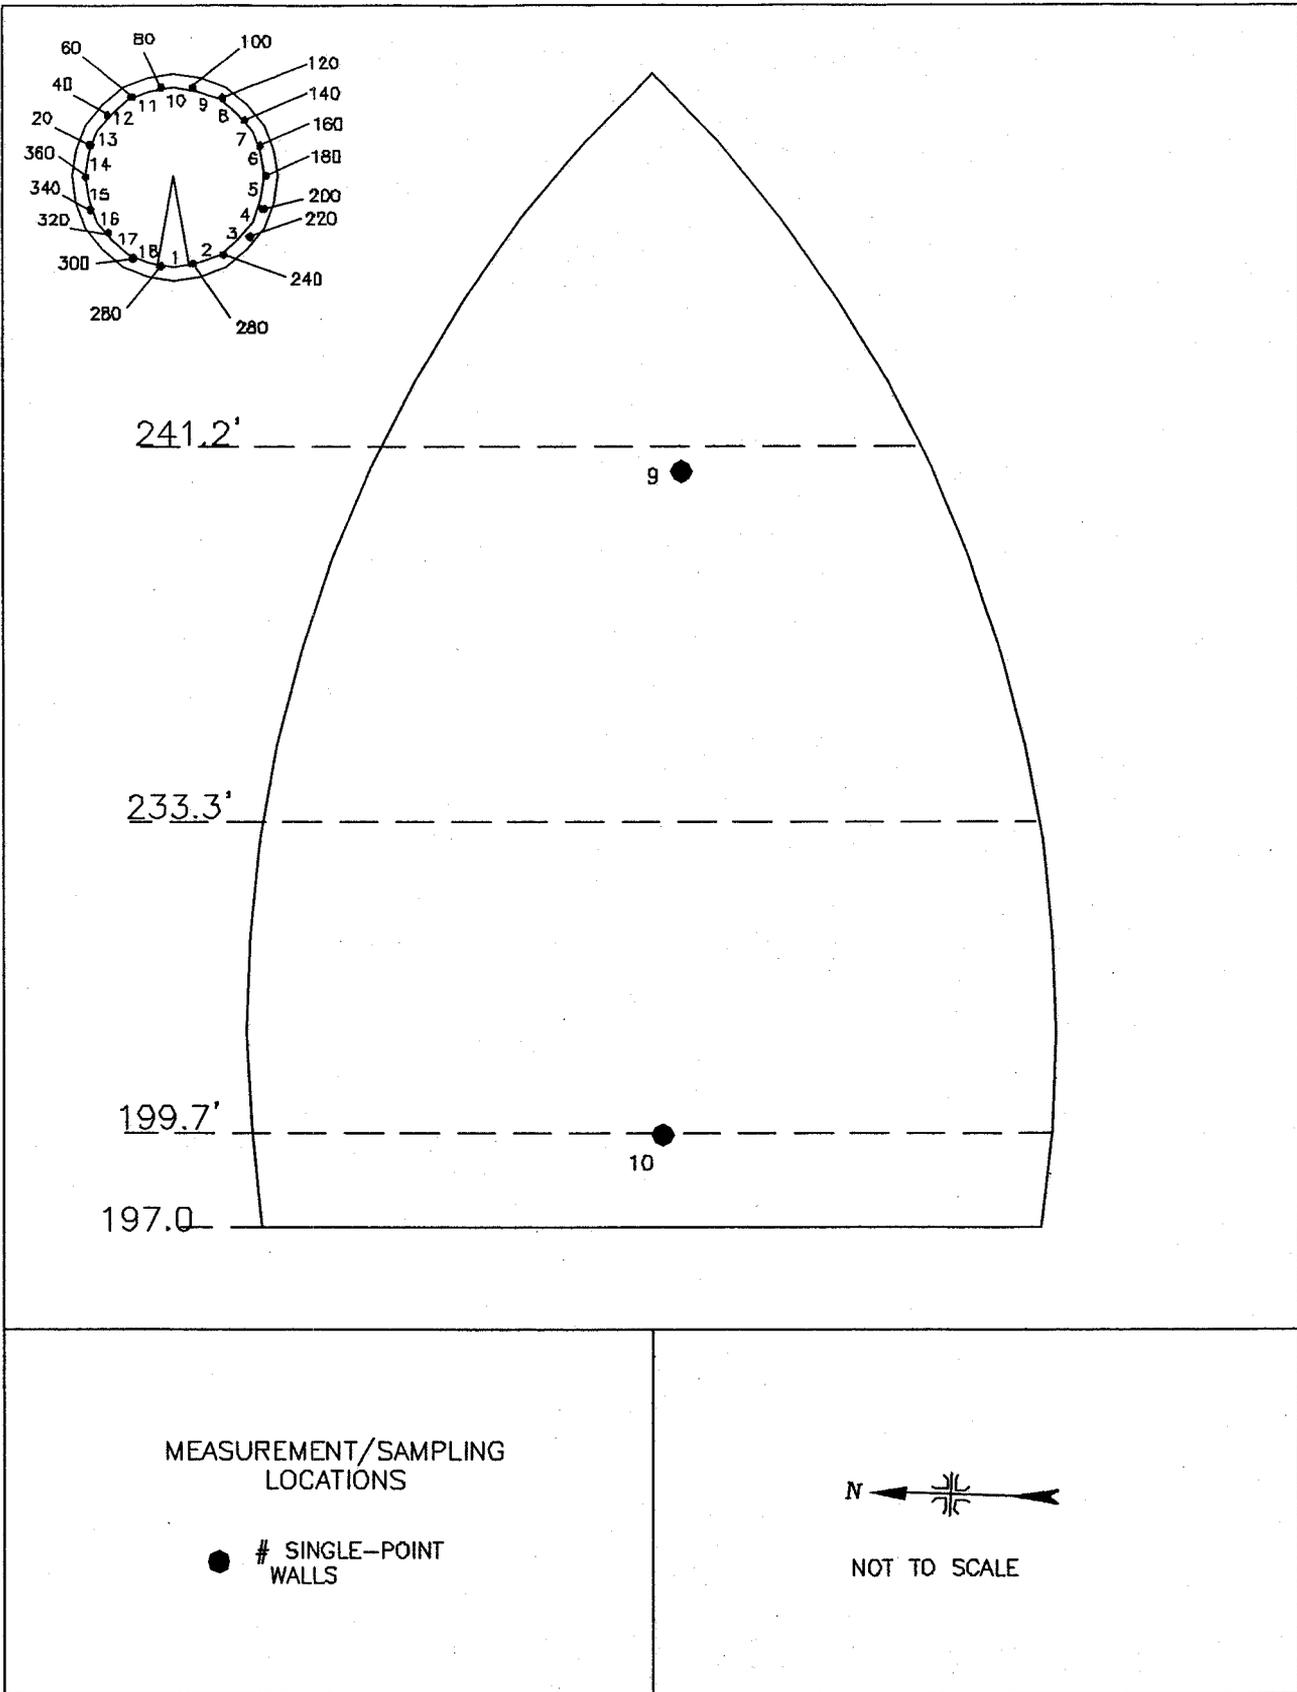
Containment Building Dome, Section I - Measurement and Sampling Locations
